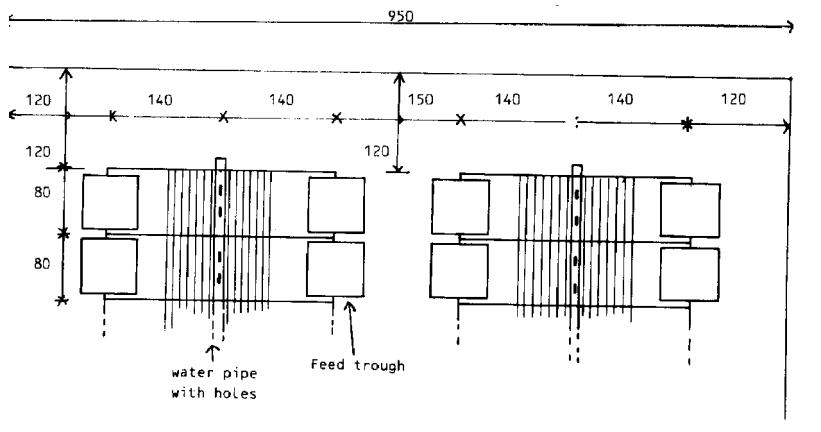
Cross-section of experimental pens for sheep and goats (in cm). An elevated floor with the slats made from wood may be a better arrangement.
